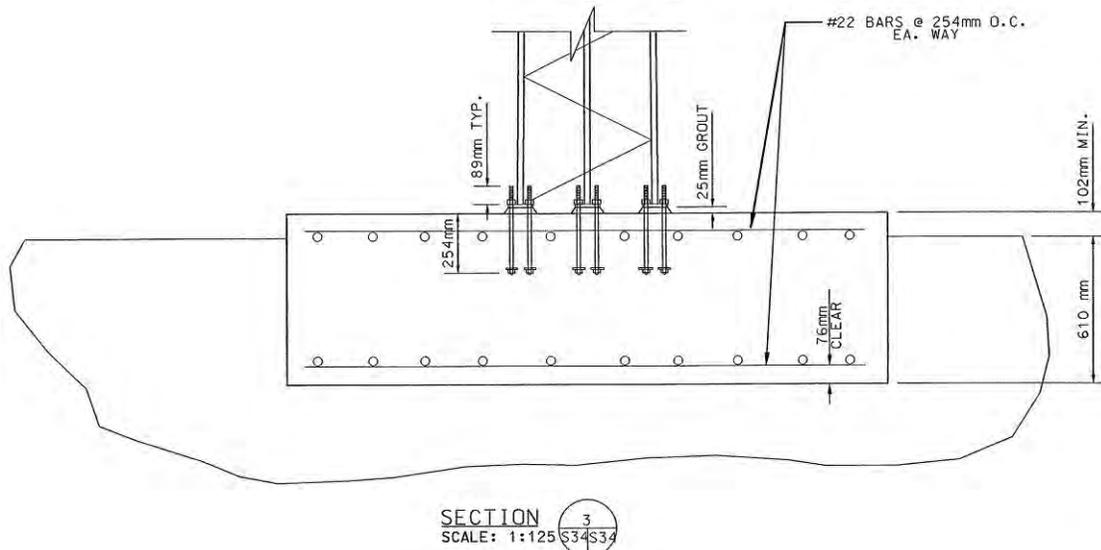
MOUT training complex mock radio tower foundation section, Fort Bragg, NC, 2002 (standard drawing 179-97-01 S-34 sheet 124; military operations in urban terrain, MOUT training complex, mock radio station tower foundation, elevation, and details; 29 January 2002).
